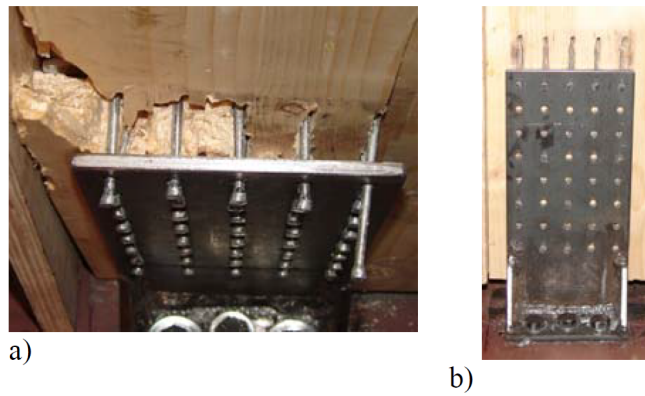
Timber rivet failure in brackets (a) showing undesired failure, and (b) showing the desired rivet yielding Popovski et al. [2010]
